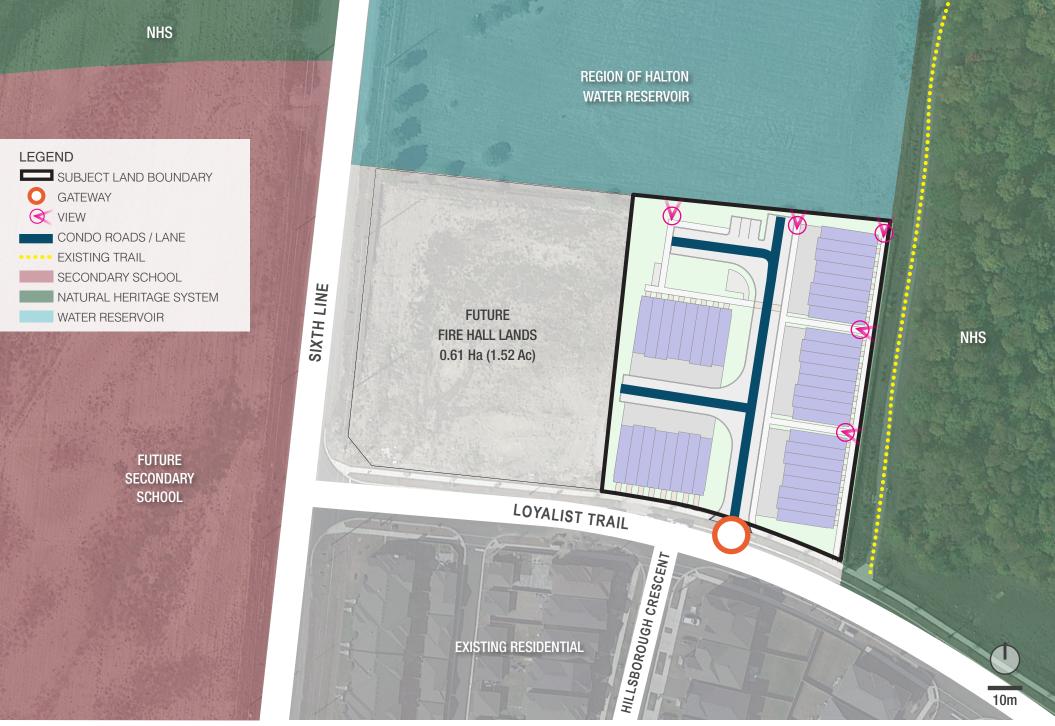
Views and Vistas Plan in the Block 154 Development
